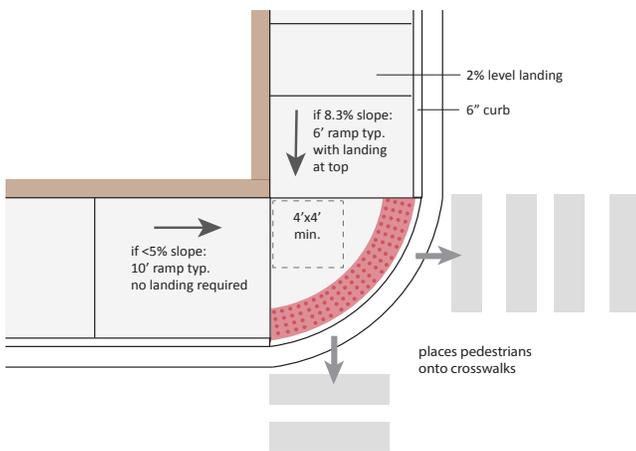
CURB RAMP IMPLEMENTATION DETAILS
